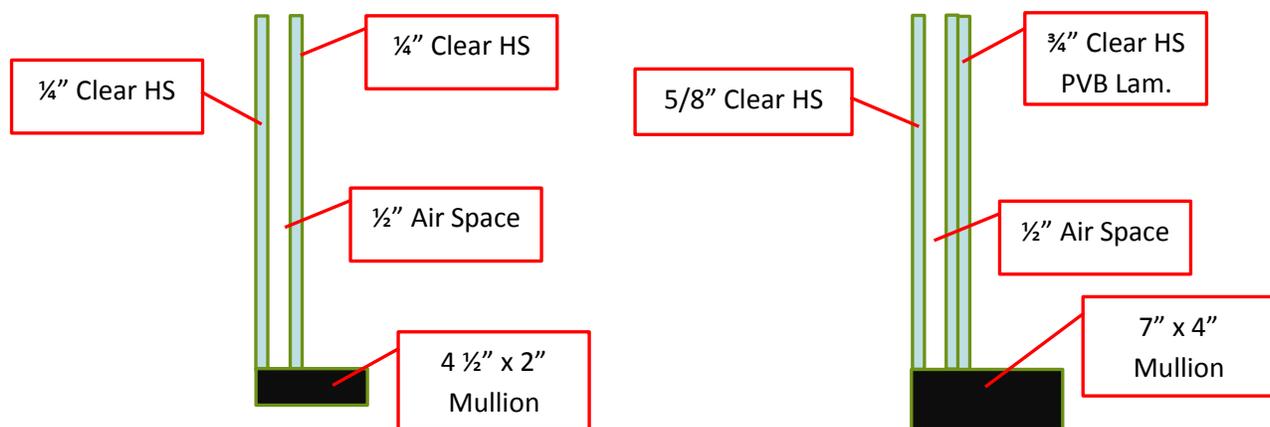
Existing (Left) and Designed (Right) Glazing at Office Levels
